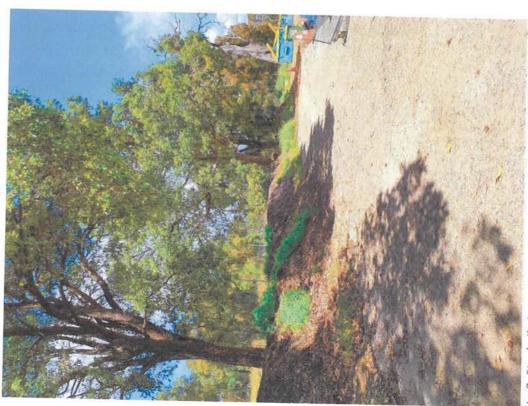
Stockpile in east portion of 'Balance of the Site' area, facing south
